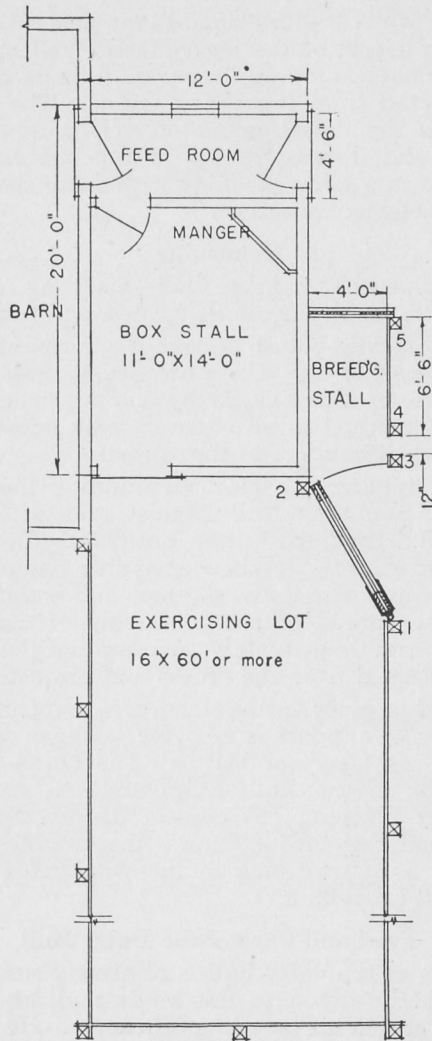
Floor plan of a bull shed, exercising yard, and breeding stall.
